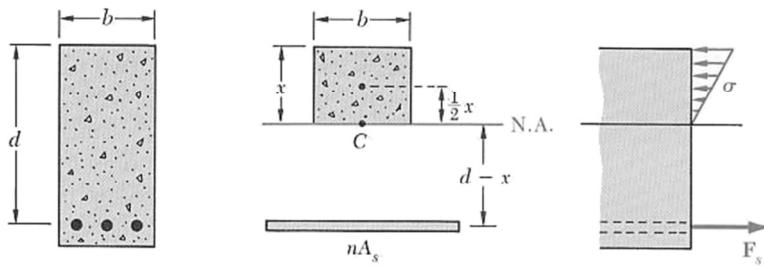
Bending in a concrete beam without and with steel reinforcing.
